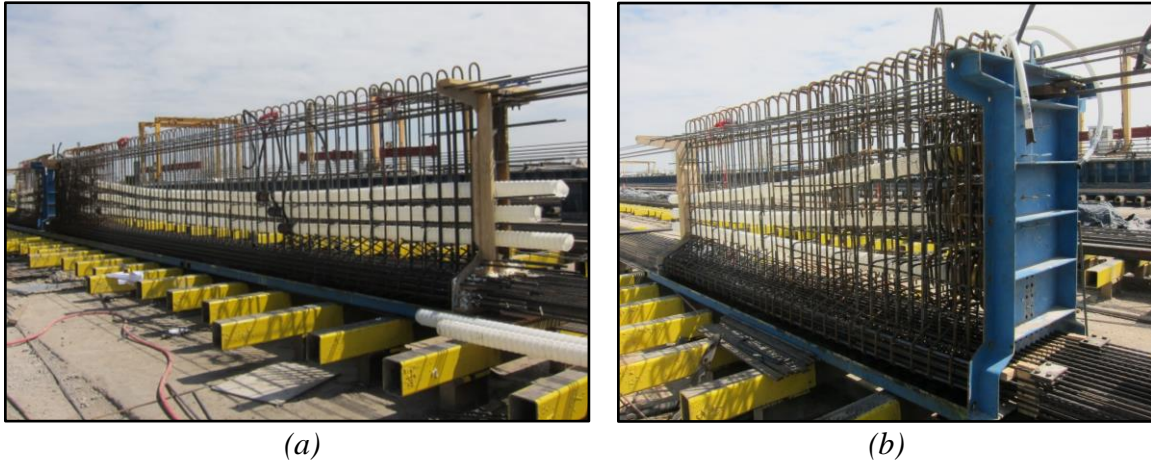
Completed reinforcing cages of precast girder segments – (a) long precast segment; (b) short precast segment
